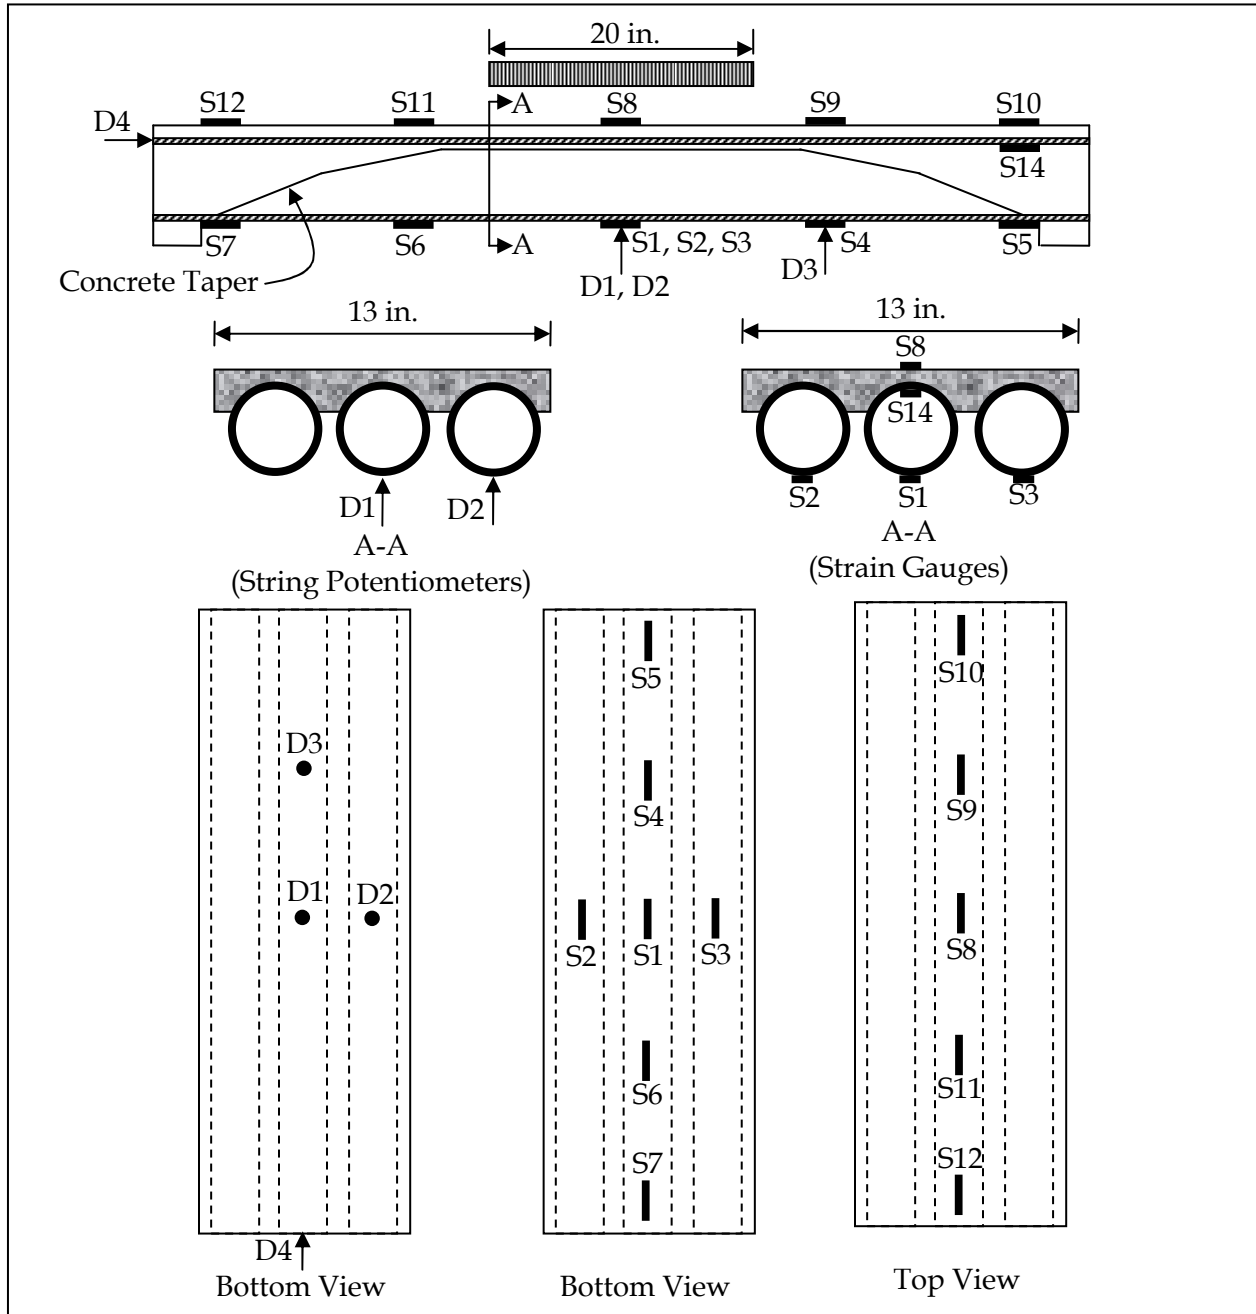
Instrumentation Plan for the Tapered Section Ductal®-FRP Deck Specimen
